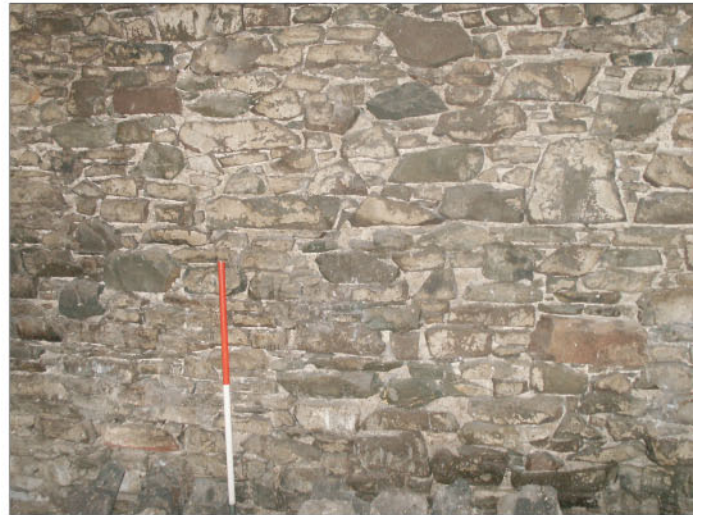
Building A, Room 2. West interior elevation. Note the set course at wall head height and the raked out pointing.
